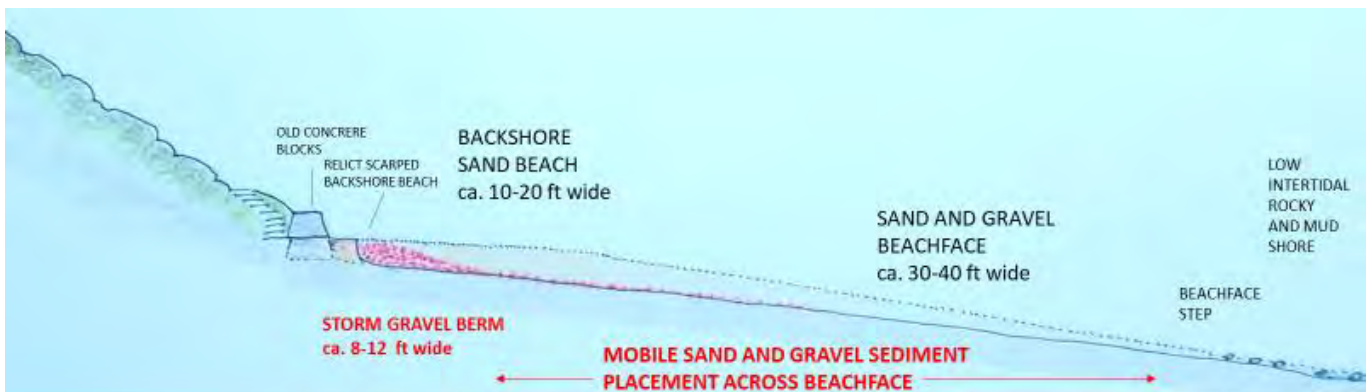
Cross-section conceptual sketch view of sand-gravel nourished beach, with storm gravel berm (exposed during storm erosion events, partly buried by sand backshore post-storm recovery beach profile), between and concrete block revetment and bedrock outcrop headland at Park boundary. No cobble is included in this reach; no sand or gravel is directly placed below the existing beachface.
